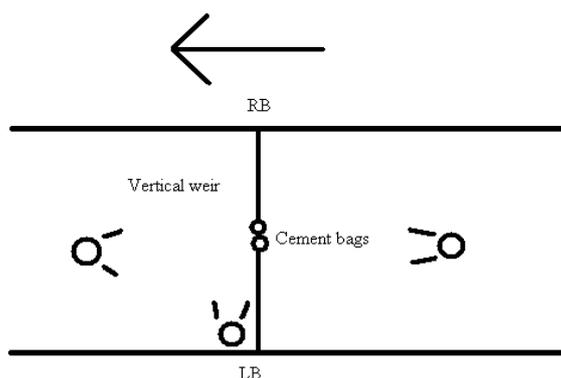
Site plan for Mereway Barrier 3
